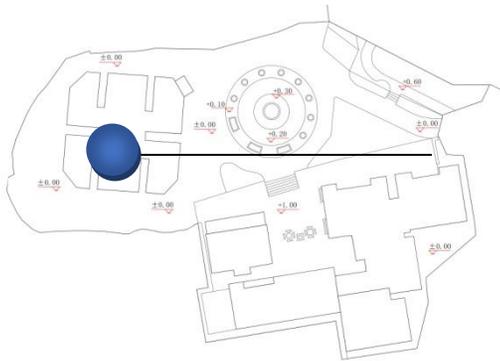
The Effect of Adding Wood Gabion Gallery Frame, Platform Rain Garden, Permeative Shale, Permeative Brick Pavement and Permeative Asphalt Road in CAD Drawing
